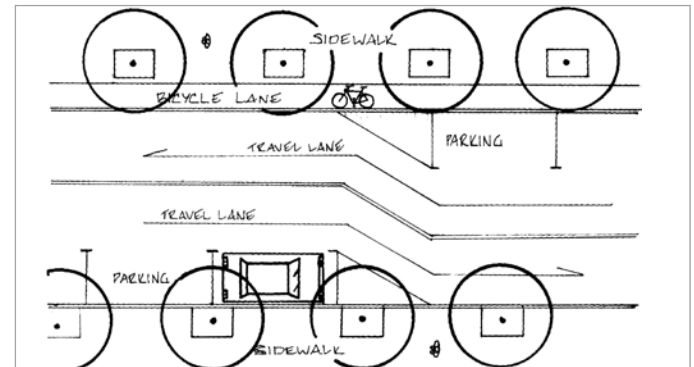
BIKE LANES: Widened sidewalks planted with street trees and bike lanes help to create a pedestrian and bike-friendly downtown.
